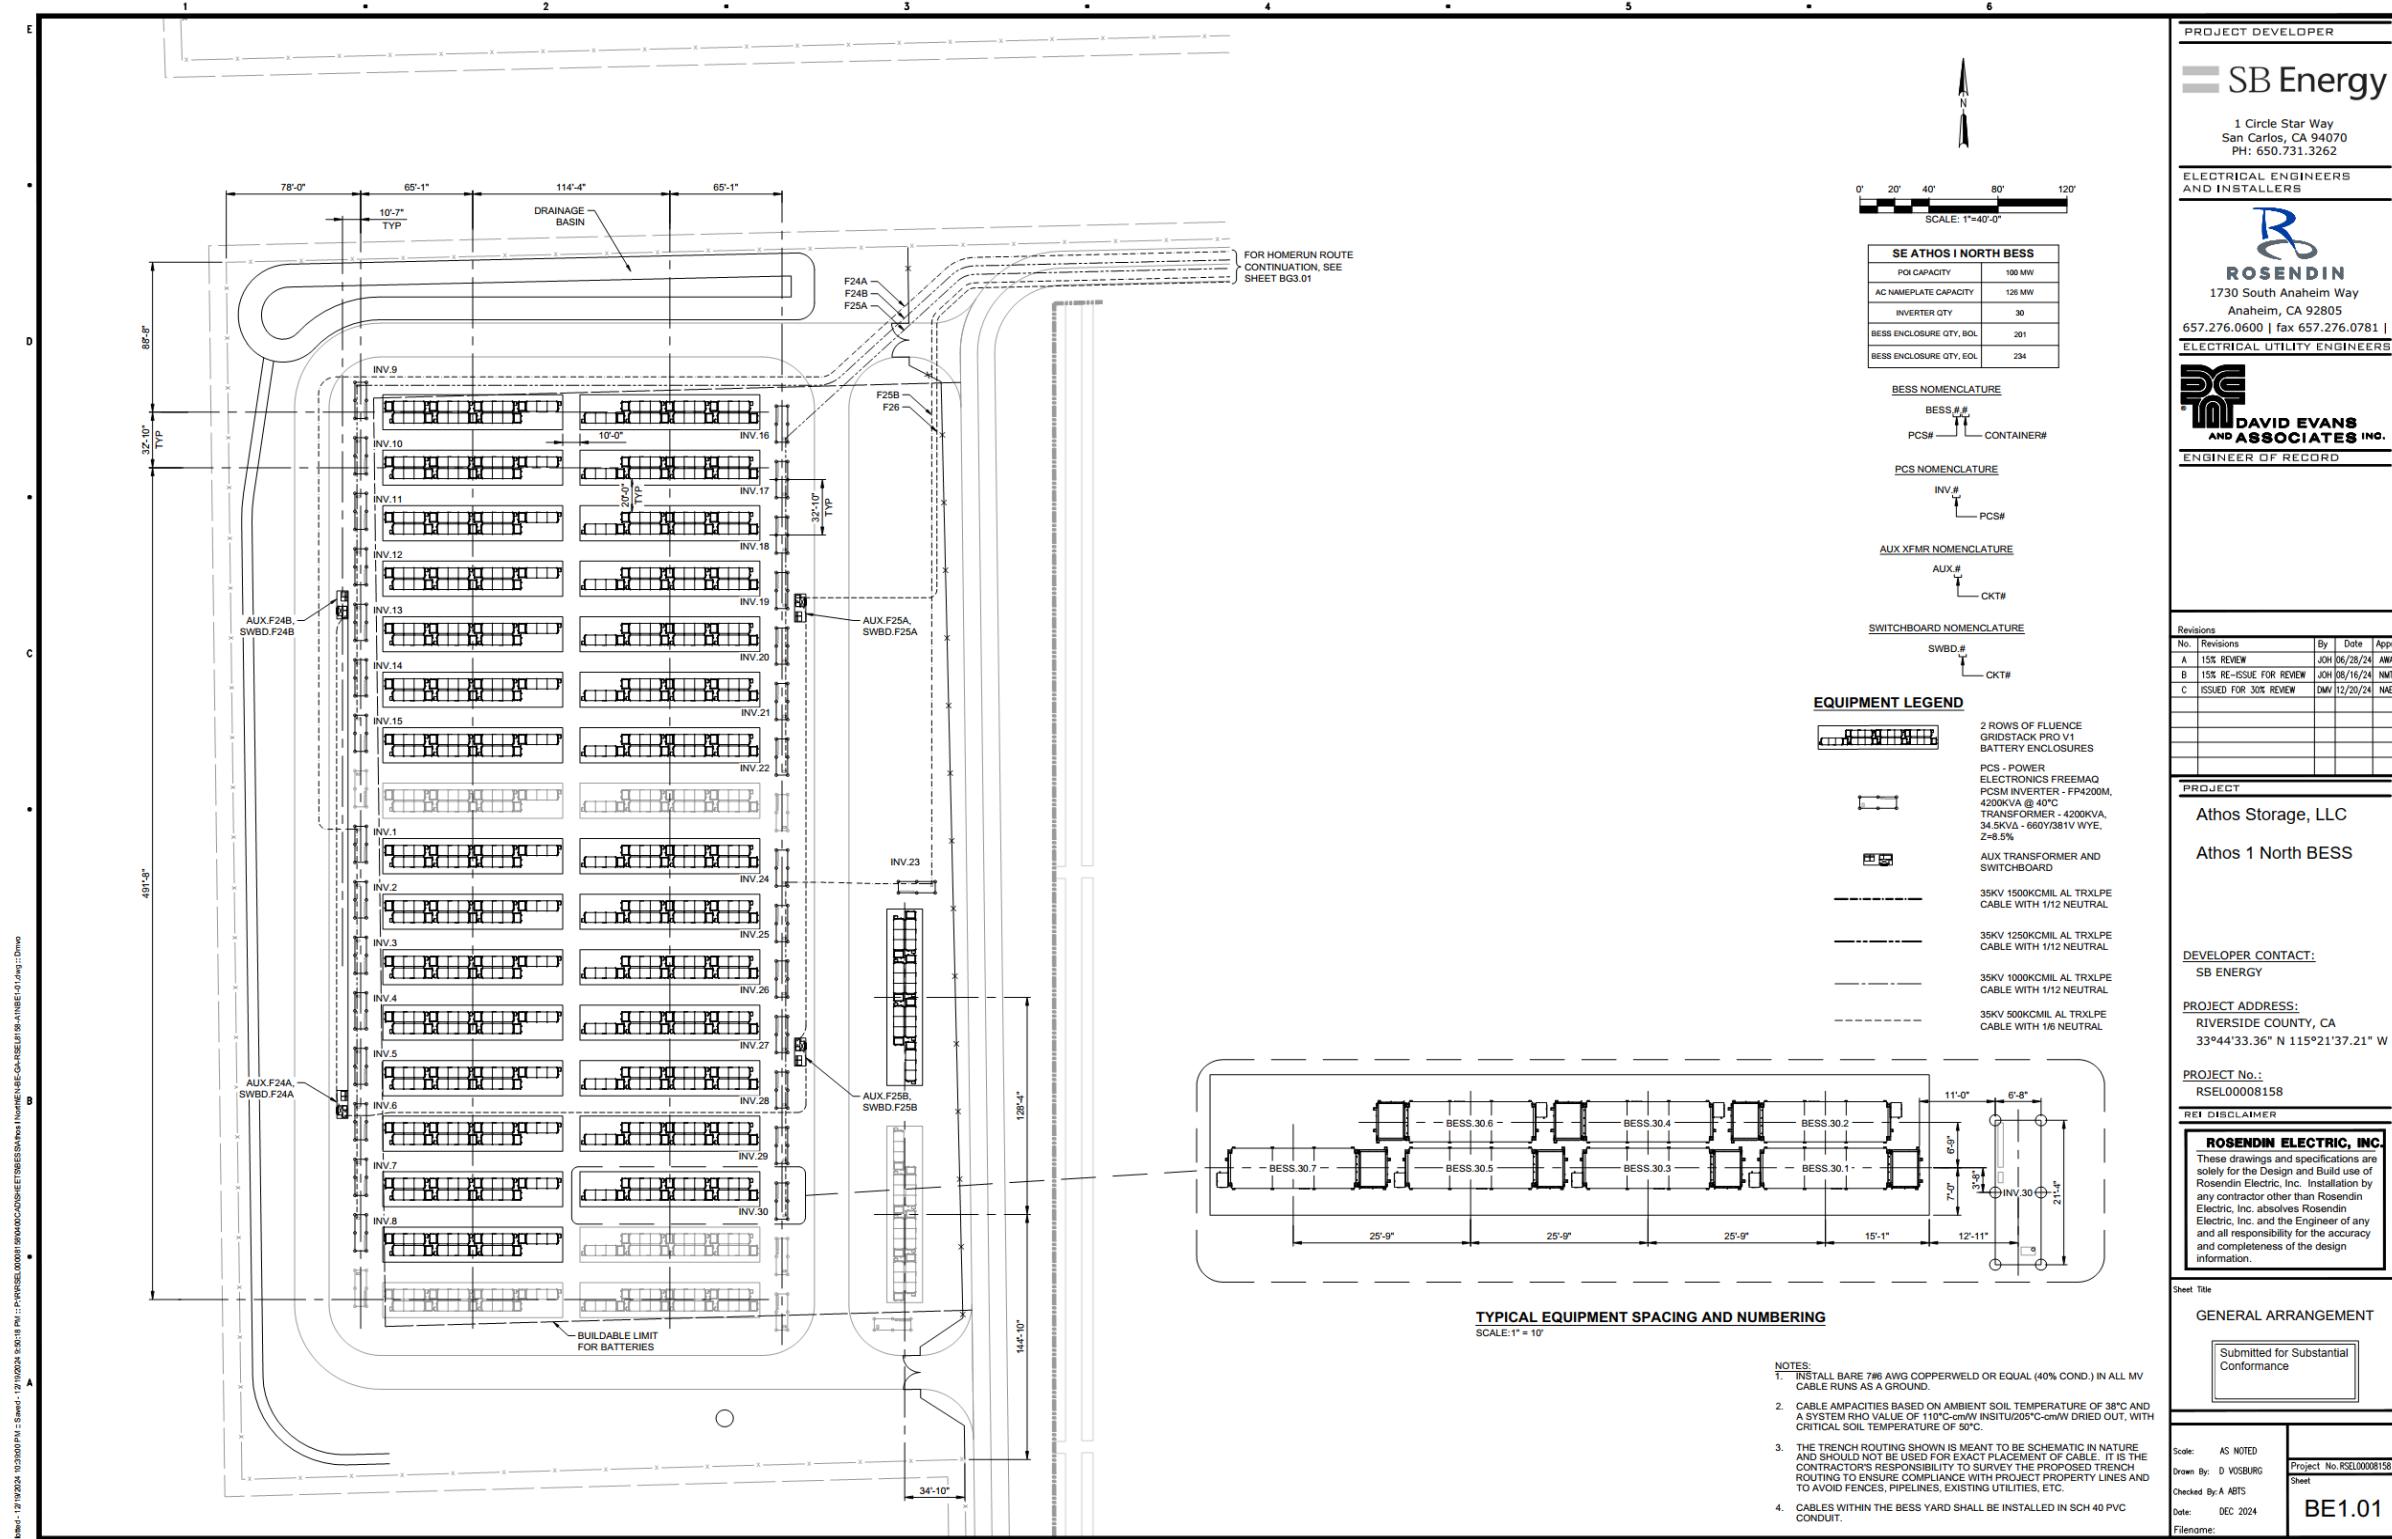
Preliminary Site Layout - BESS Site 3, Section 1
